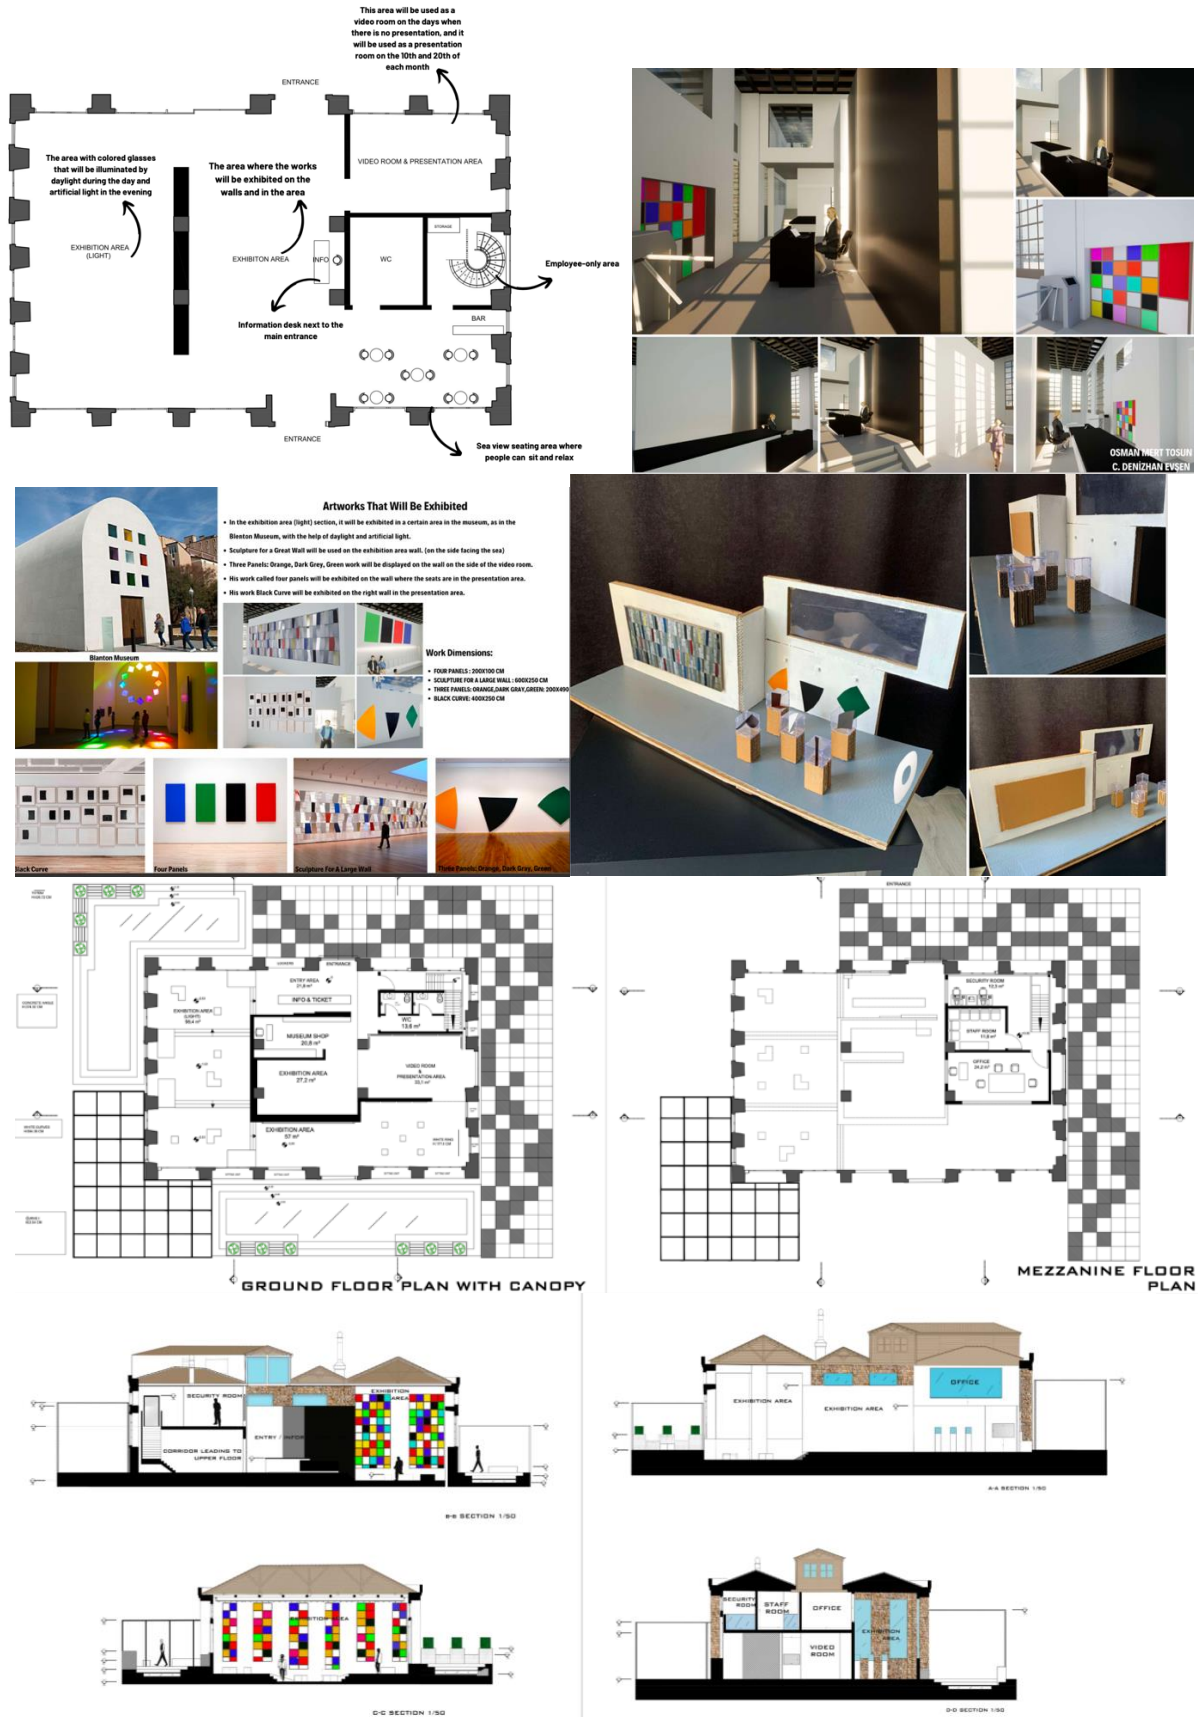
Detailed rendering drawings, plans and sections, and 1/20 model
